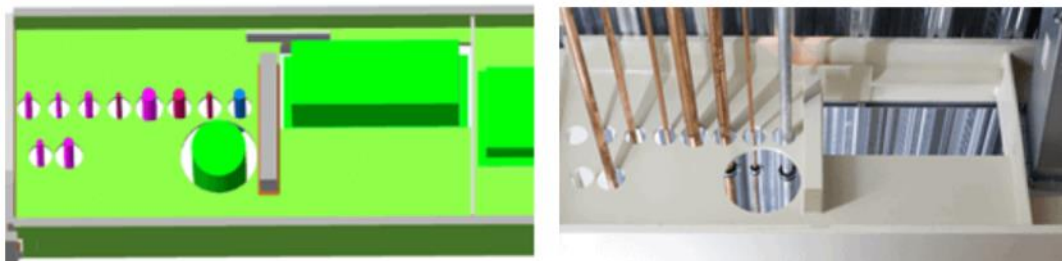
Pre-planned openings in BIM model (left) and corresponding openings in steel beams (right) (adapted from (Trimble, 2017)
